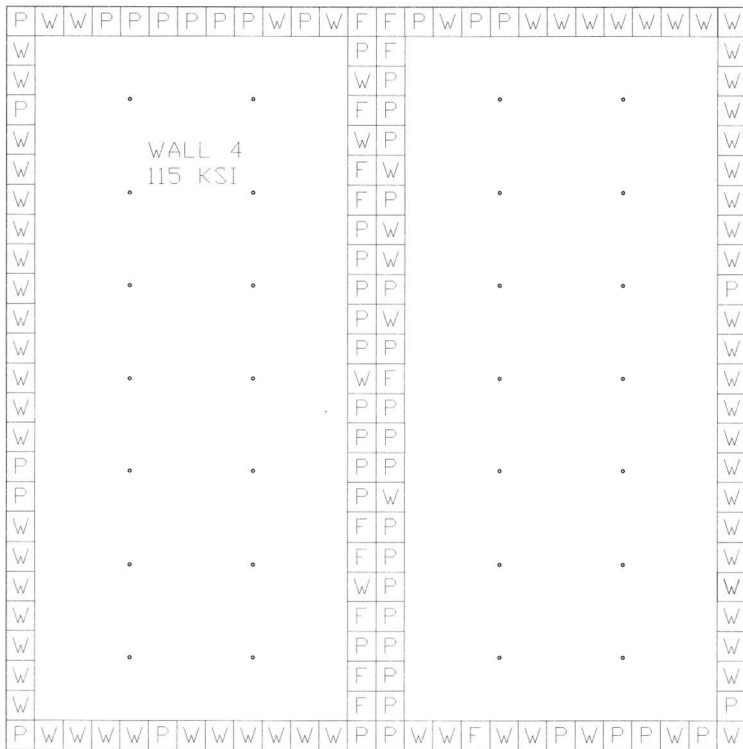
Sheathing nail failure modes for Wall 4, $f_{yb}=115$ ksi.
